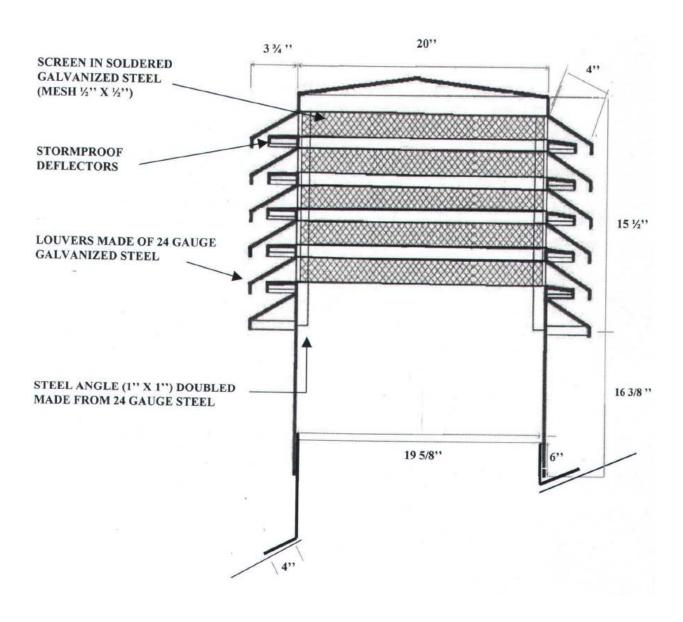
# DETAIL DRAWINGS (CONT.) ROOF VENTILATOR #301 (18 x 18)
